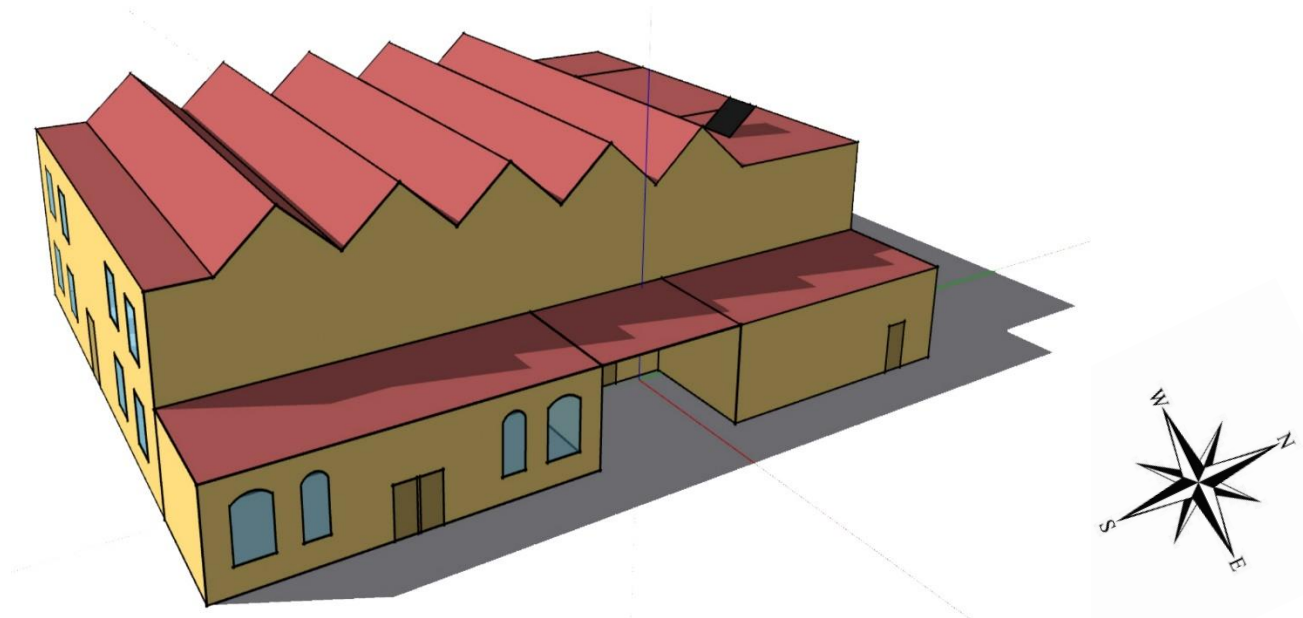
SketchUp 3D 2nd view of the building envelope
